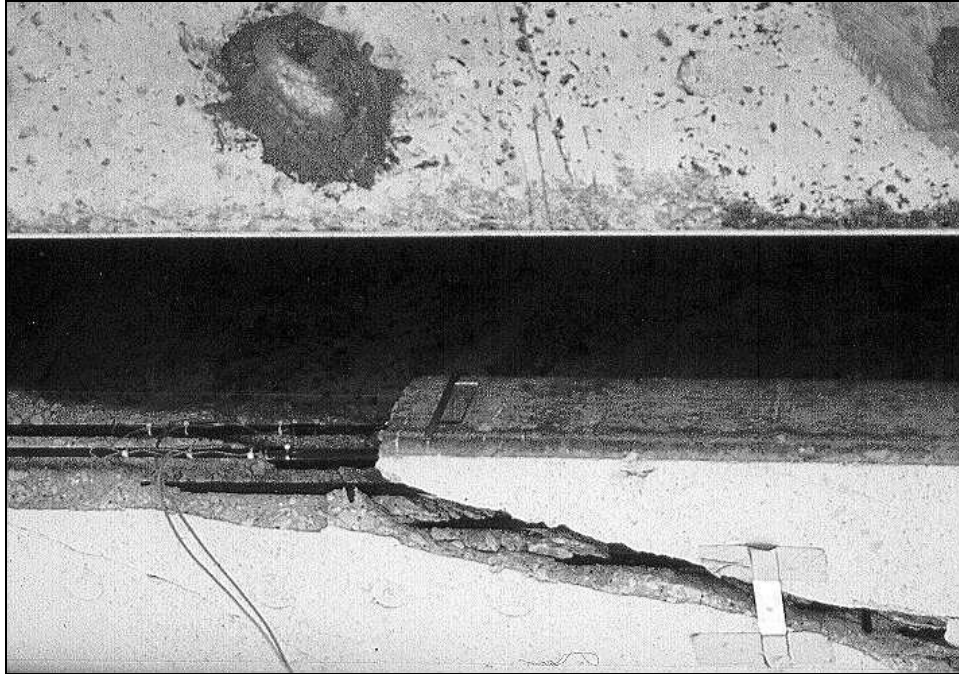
11 Example of an offset section of the damaged girder
